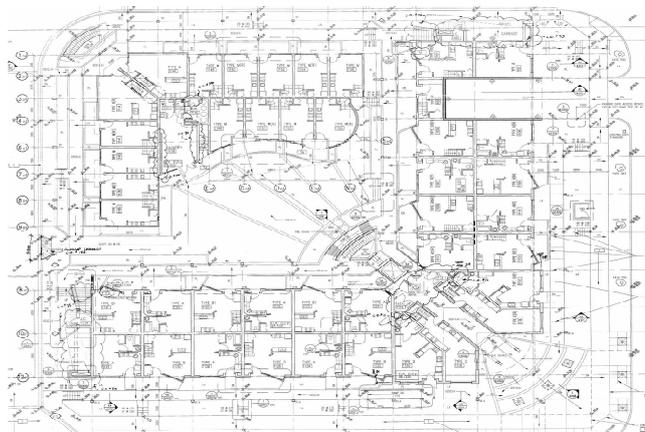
Drawing 780-06-012, Buildings A1 & A4
